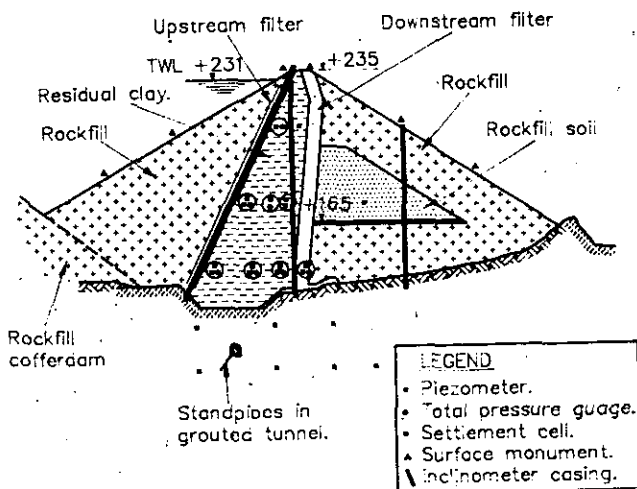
Cross sections of main dam showing dam construction and arrangements of instruments.
